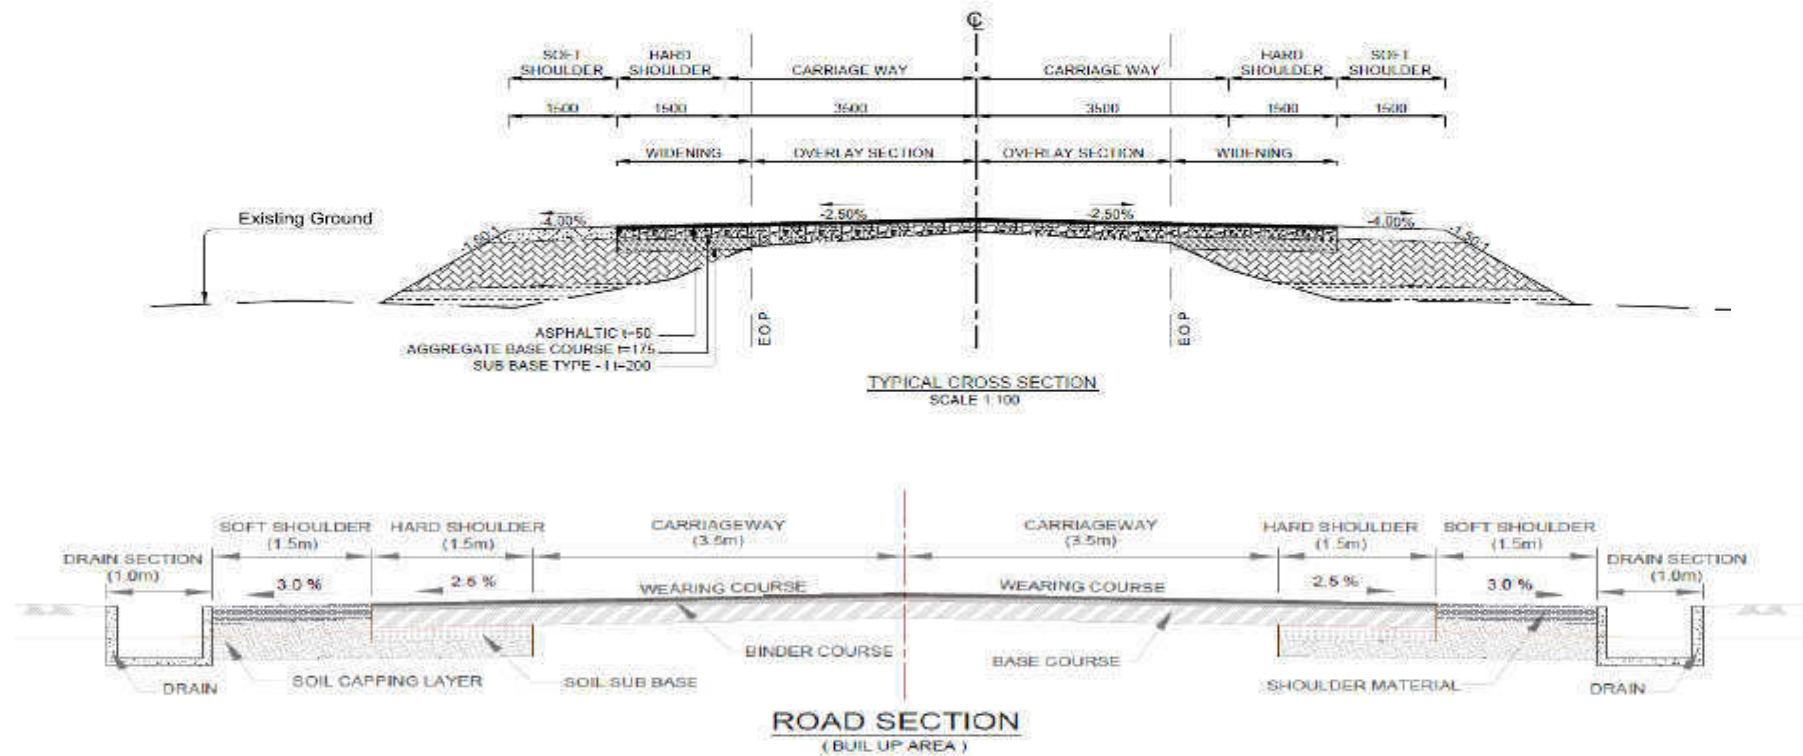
Proposed Cross Section for the Development (Source: RDA)
